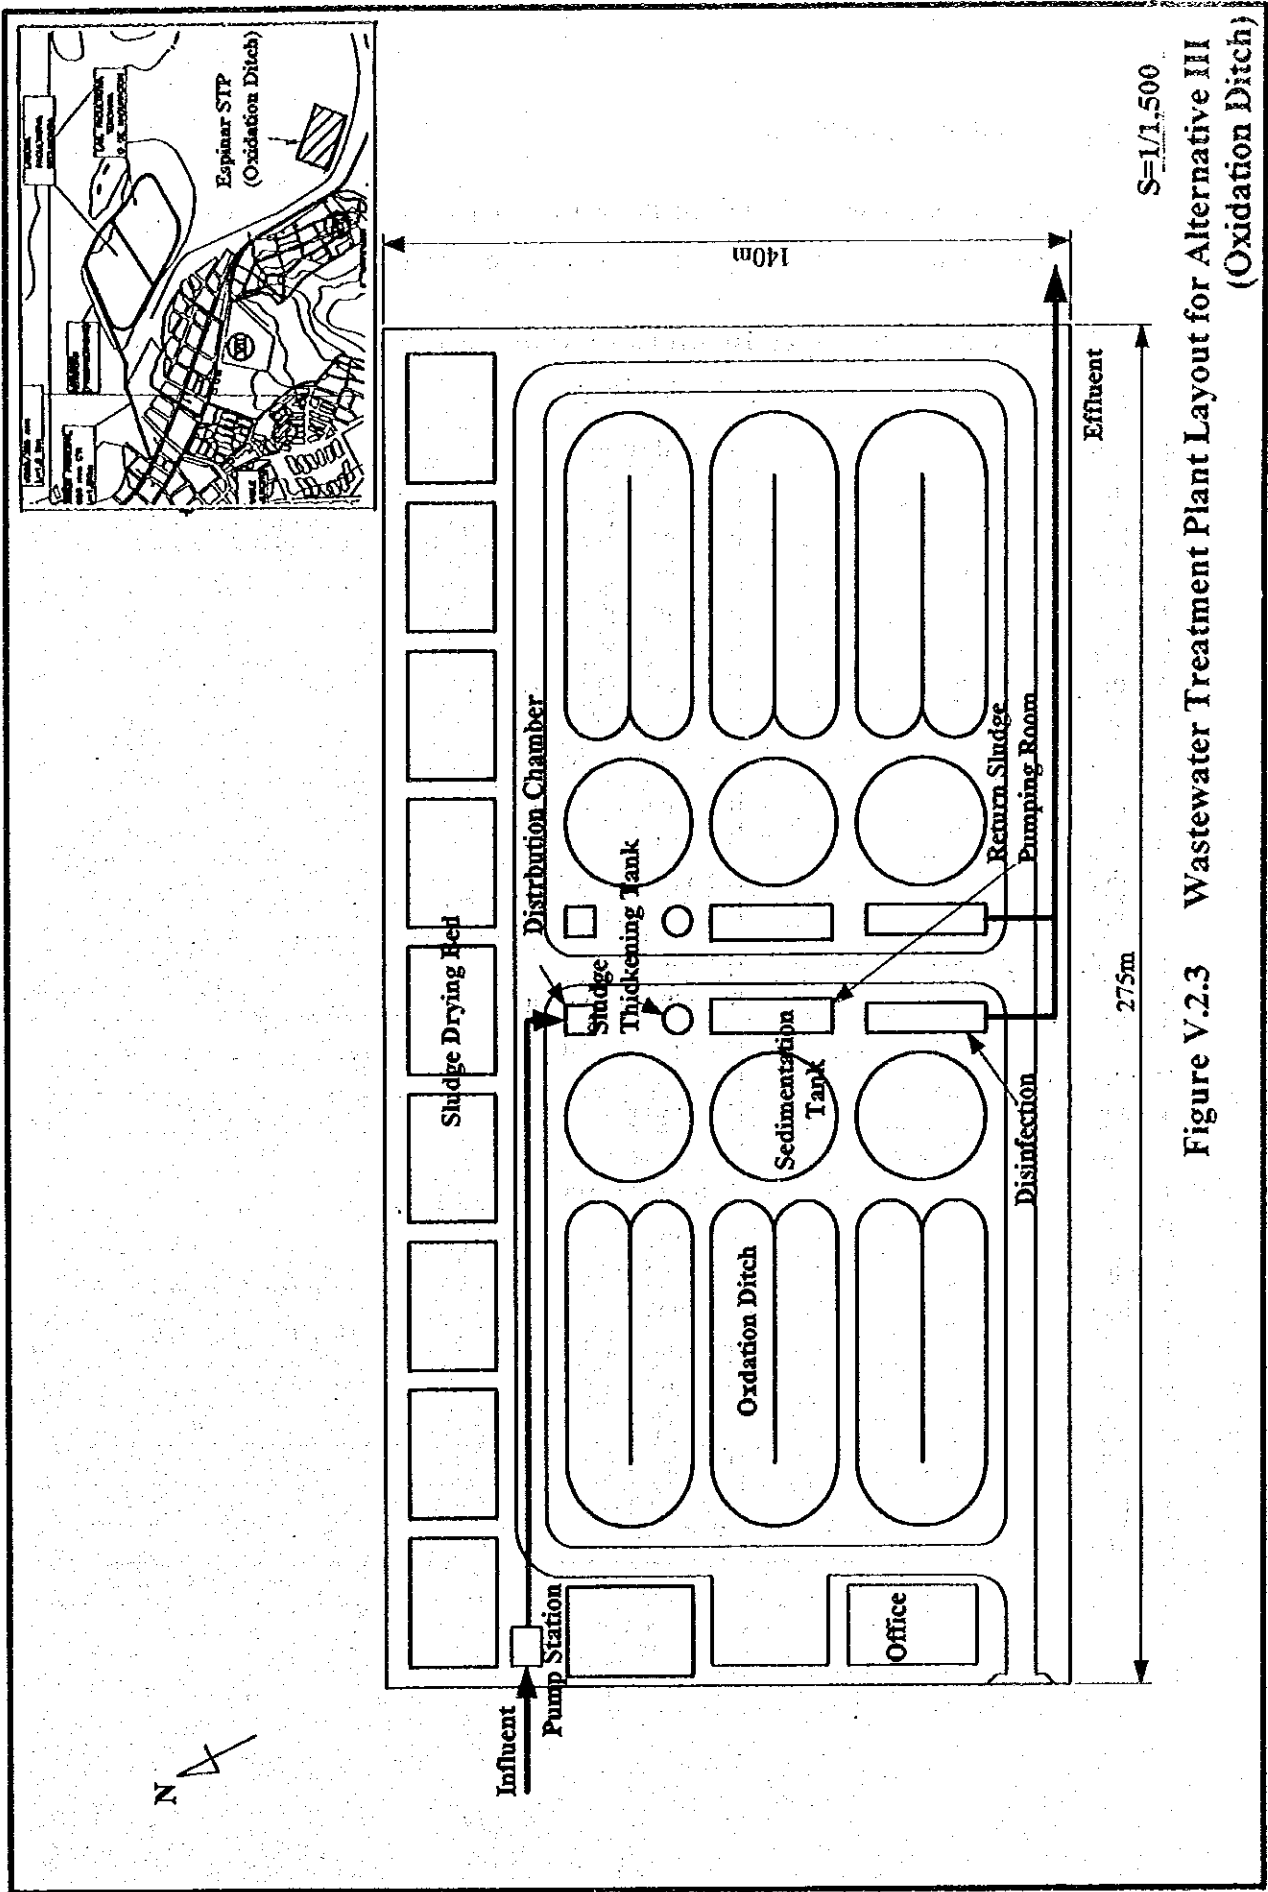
Wastewater Treatment Plant Layout for Alternative III (Oxidation Ditch)
